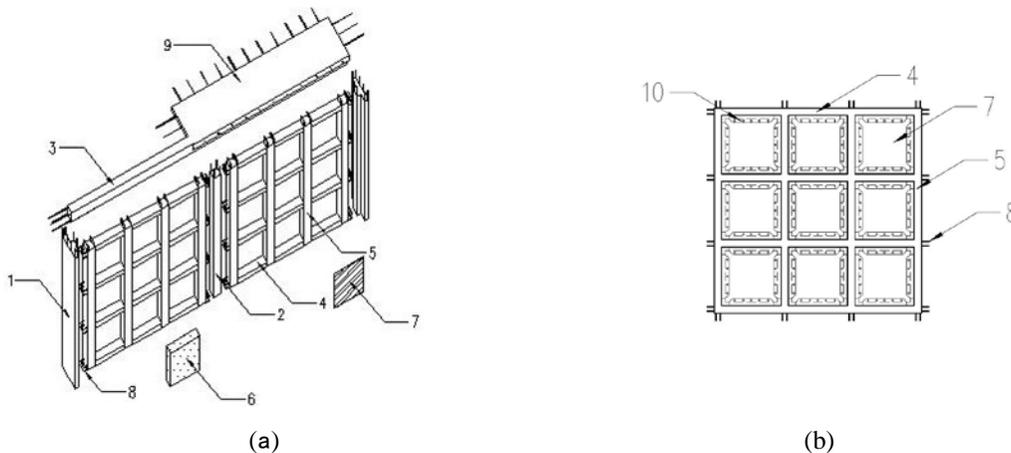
Multi-ribbed composite wall structure system: (a)MRCWS construction drawing; and(b) multi-ribbed composite wall slab with light filled blocks.
